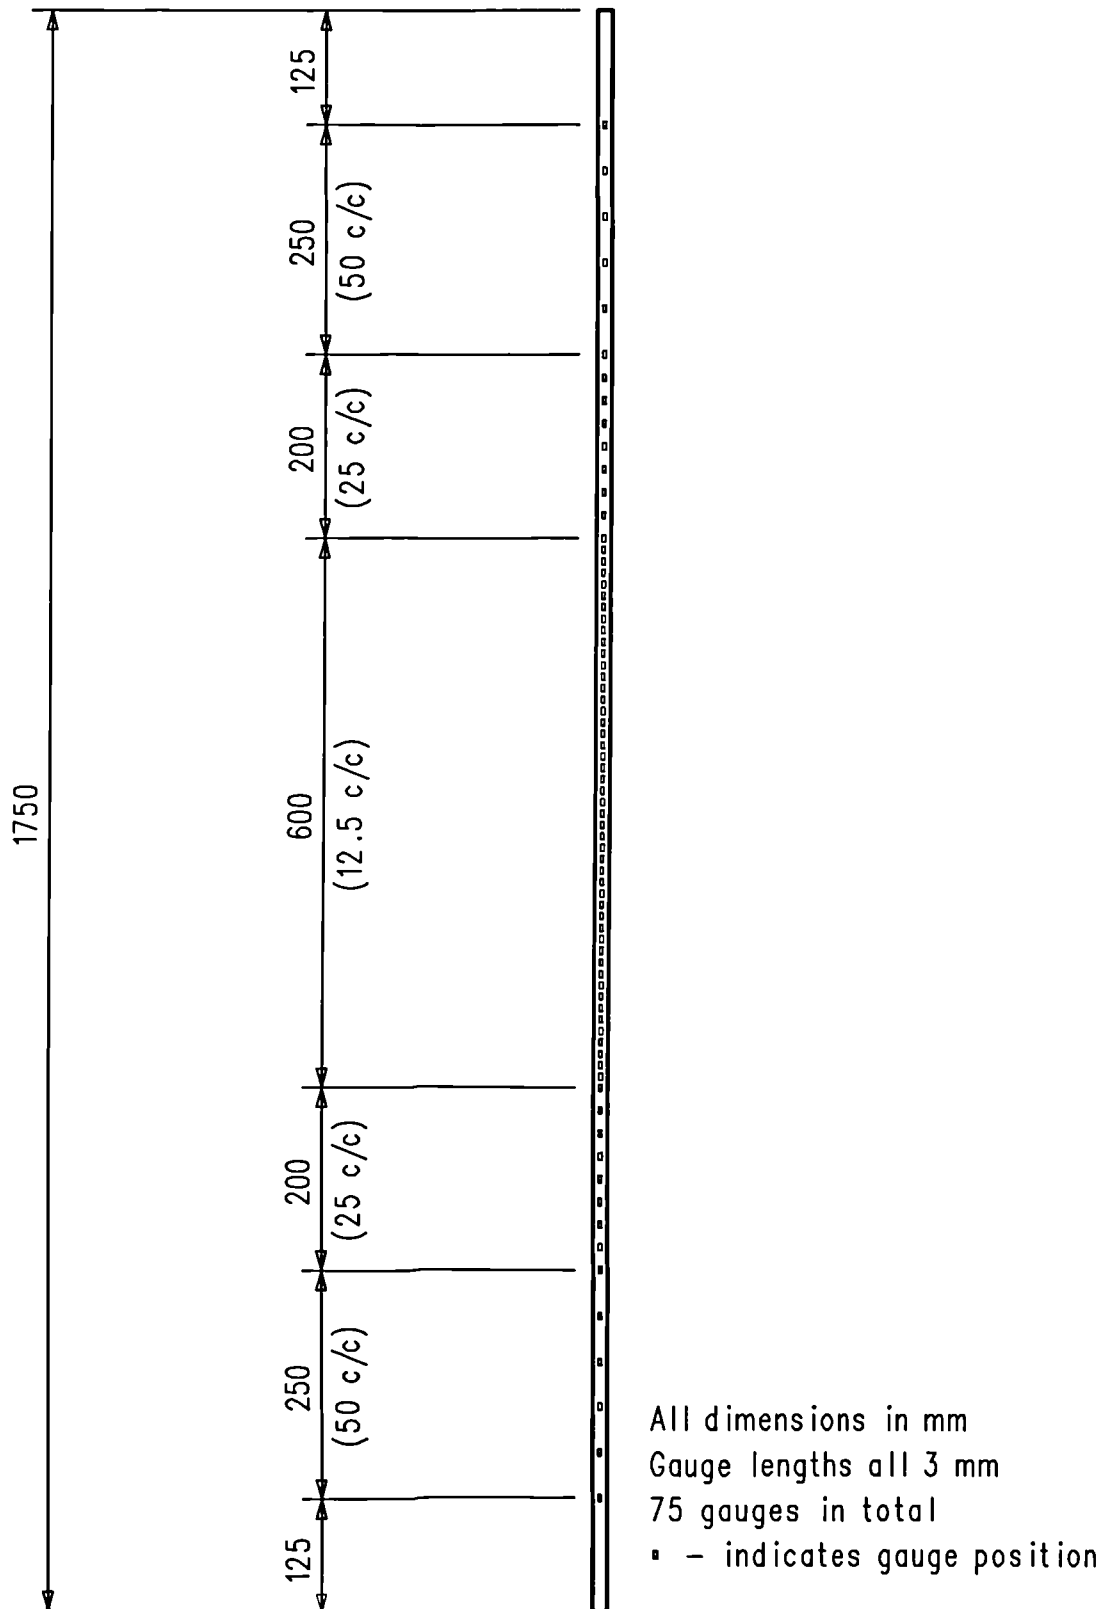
Column rebar - strain gauge layout A
